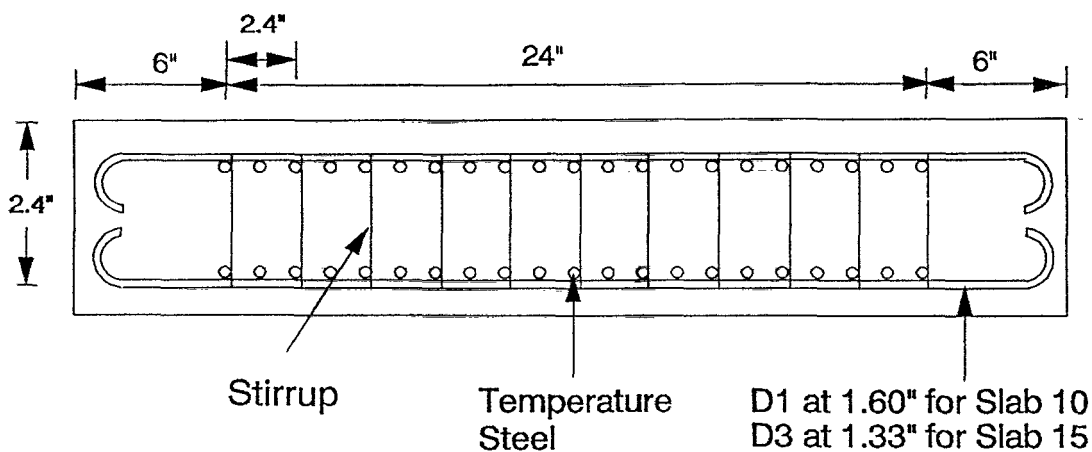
Sectional View Through Length of Slabs No. 10 and 15
